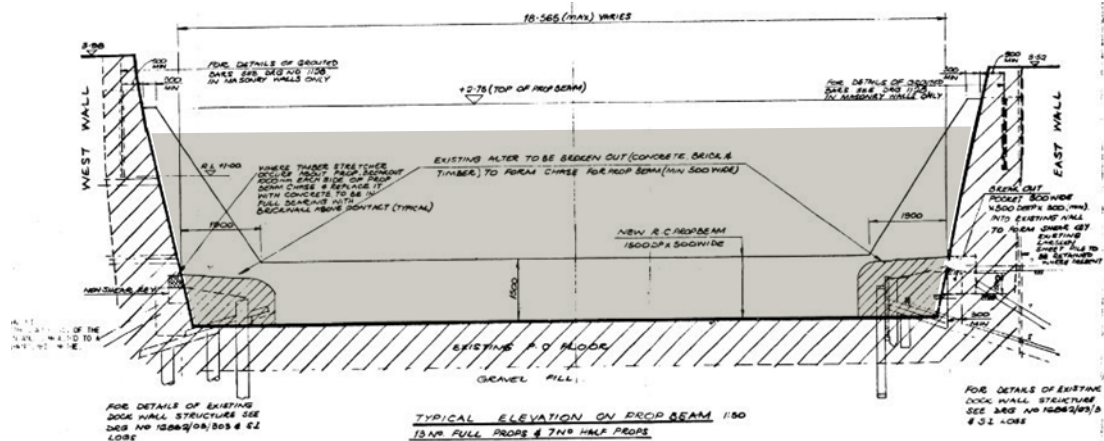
Blackwall Yard 1803 graving dock cross-section, full of silt to the level shown by shading at commencement.
